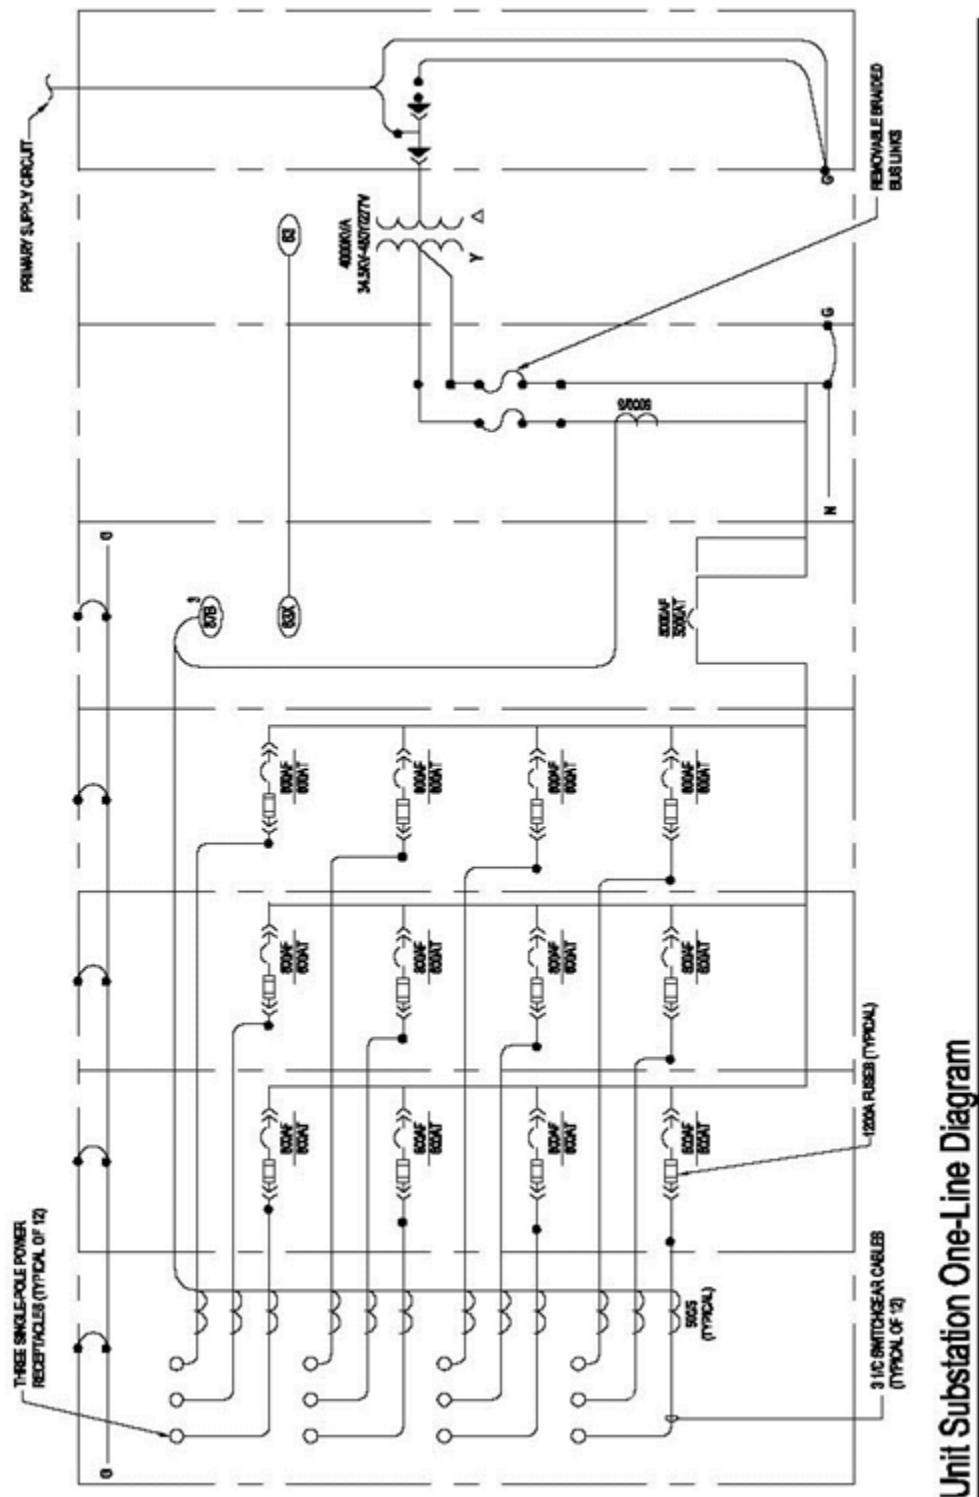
(c) Electrical System for a Double-Deck Pier (3 of 9)
